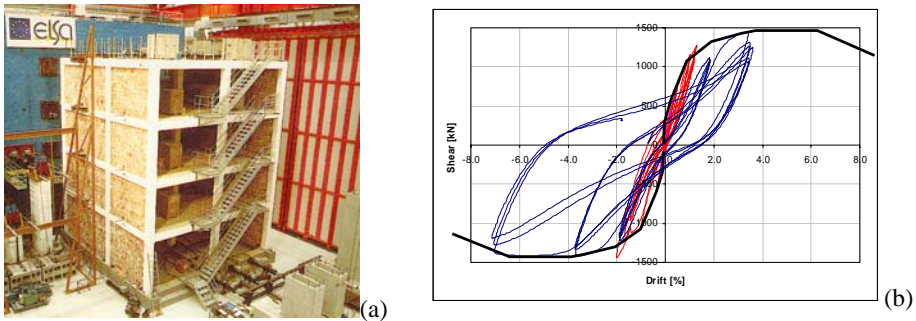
R/C structure tested at ELSA: (a) Infilled frame configuration; (b) Bare frame 1st storey shear-drift diagrams.
